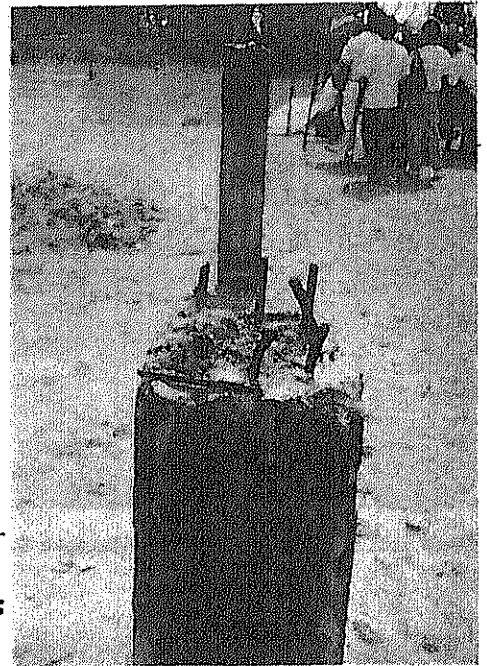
Substructure for widening of Magsaysay Bridge; Closer view
